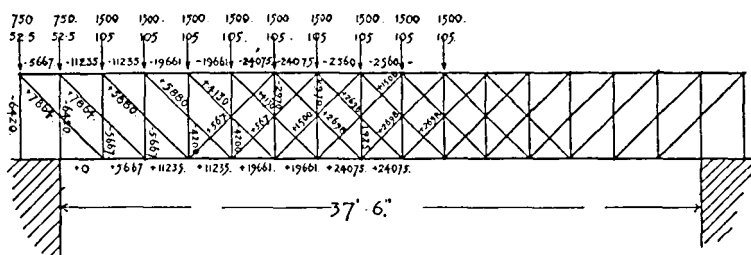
Four such girders to be used. They are made by combining two girders with stresses as in *Fig. 5*.
